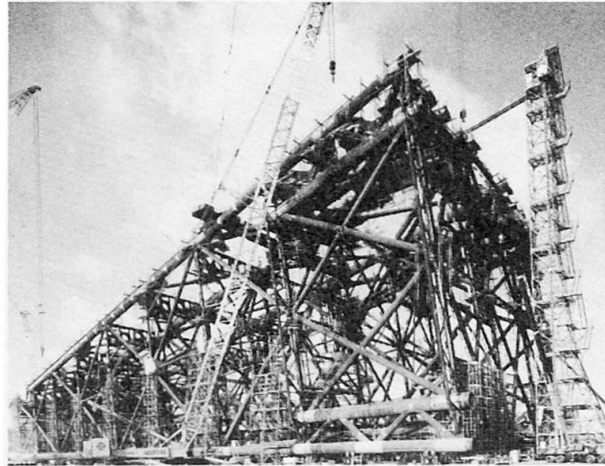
The 15,000 ton Iwaki platform jacket under construction
